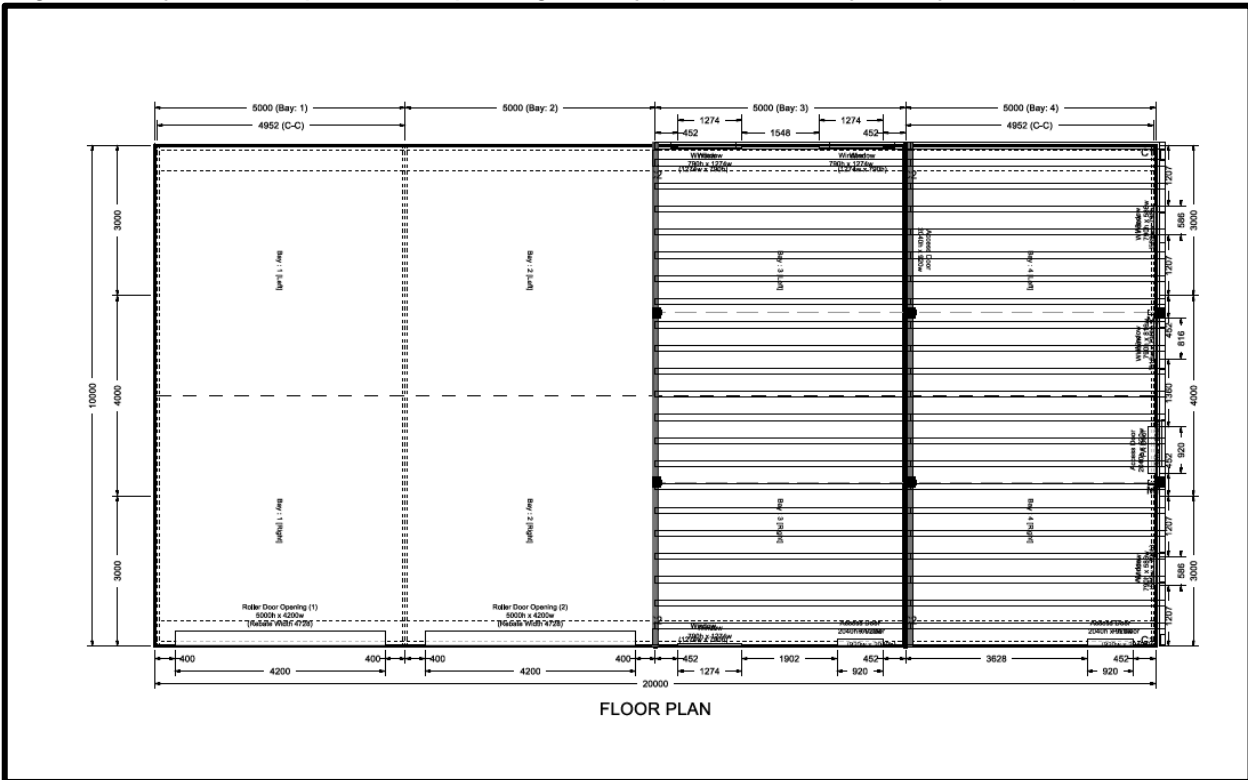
Shed and Office Floor Plan (Source: Tumut River Sheds)
